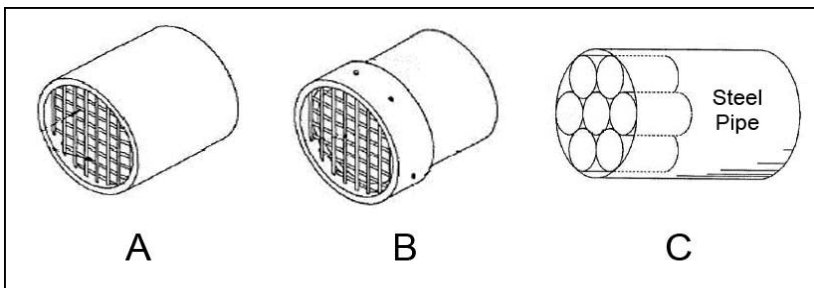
Culvert grill examples (A: Steel culvert grill; B: Concrete culvert grill; C: Large culvert with short honeycomb pipes) (From MIL-HDBK-1013/10)
